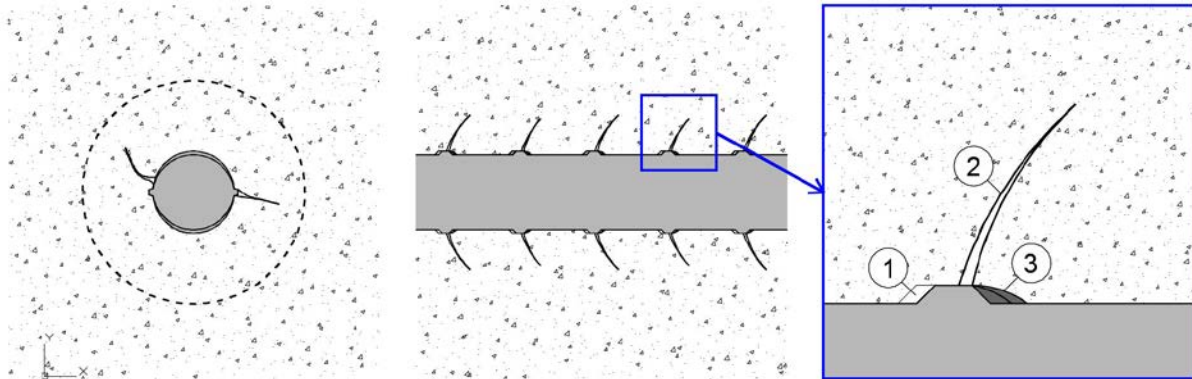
Schematic presentation of contact failure between ribbed rebar and concrete. (1- slip, 2-micro crack, 3-area of crushed concrete) .
